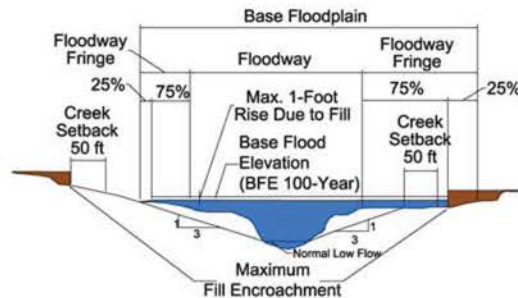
Floodway Fringe Encroachment and Creek Setback Schematic
